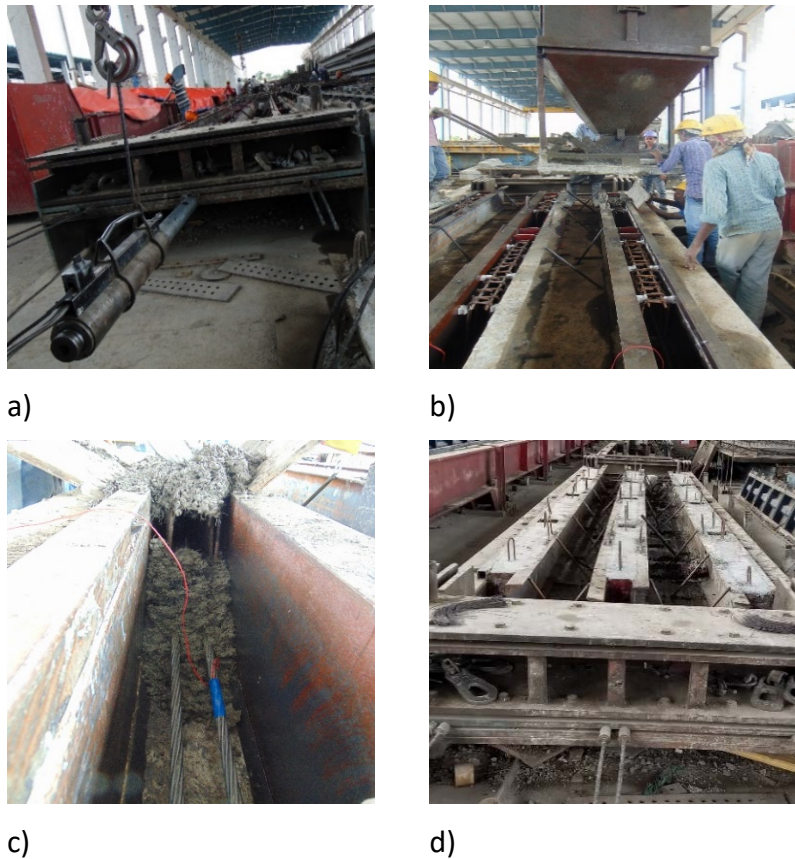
Casting of beam specimens; a) Prestressing by mono-strand jack; b, c) Placing of concrete in moulds; d) Beams after 7 days of curing
